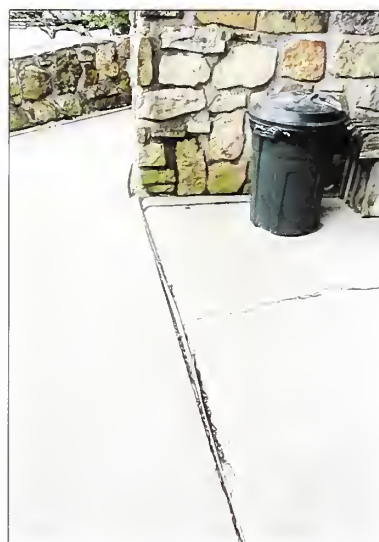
This concrete slab is cracked and is spalled at the edge of the control joint. The deficiencies should be repaired.
